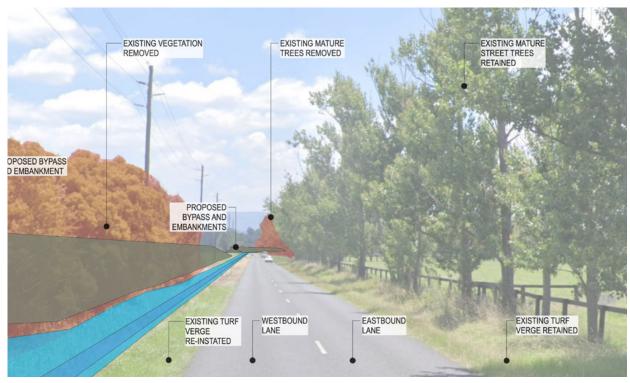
Viewpoint 7 - Proposed view from Inalls Lane, looking north west
